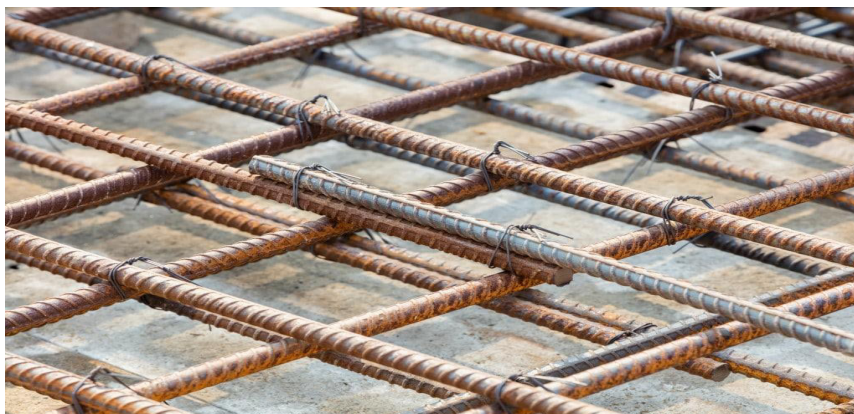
Tying rebar (reinforcement bars) using wire
